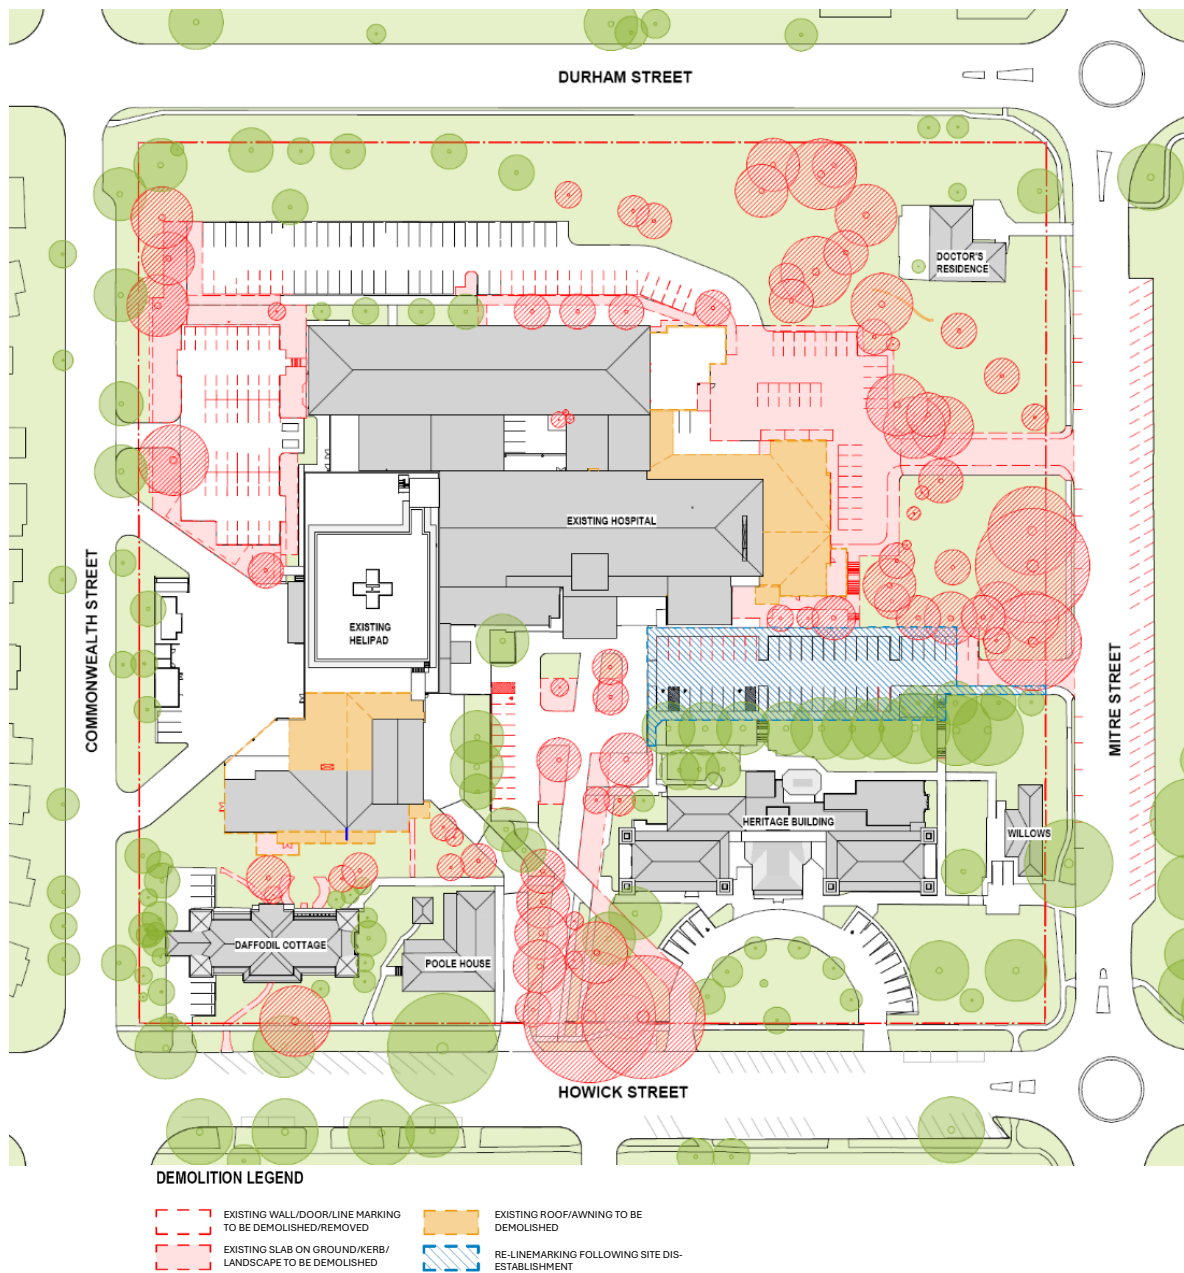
Proposed Demolition Plan (Source: BLP BHR-BLP-DRW-ARC-SSD-002-XX001 [C]).
